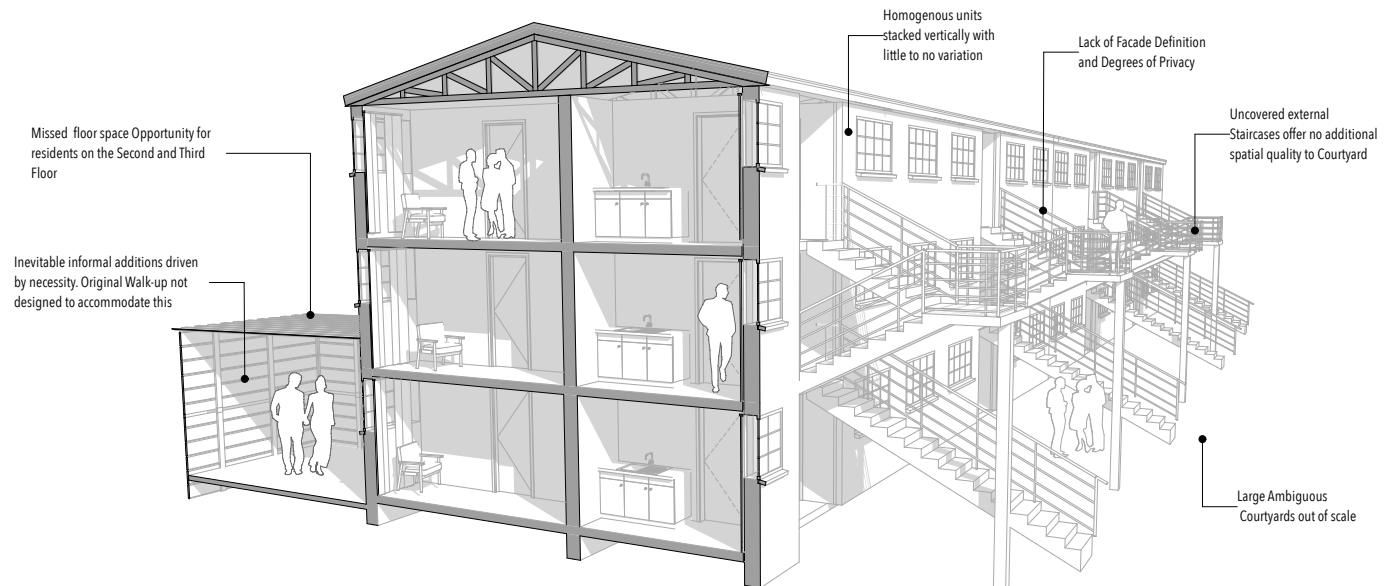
plan and sectional perspective of a typical existing three- storey walk-up
